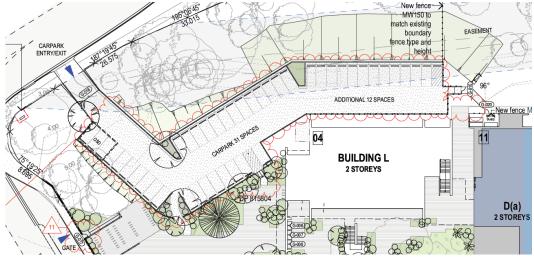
Proposed AREF Car Park Reconfiguration Plan
